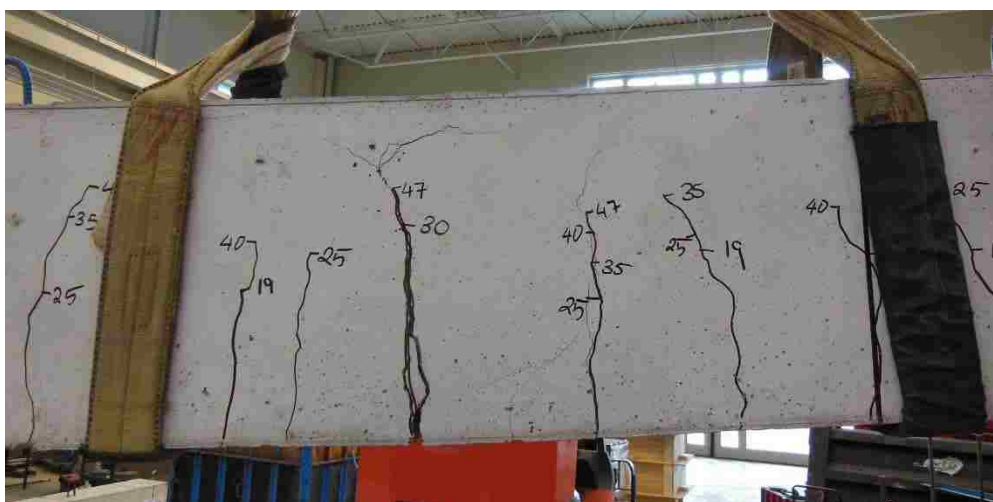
Crack Pattern of Specimen BWC-60 (Side View)
